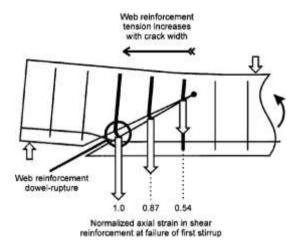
Variation in shear reinforcement strain and concrete reinforcement slip along shear crack, just before failure of first stirrup
